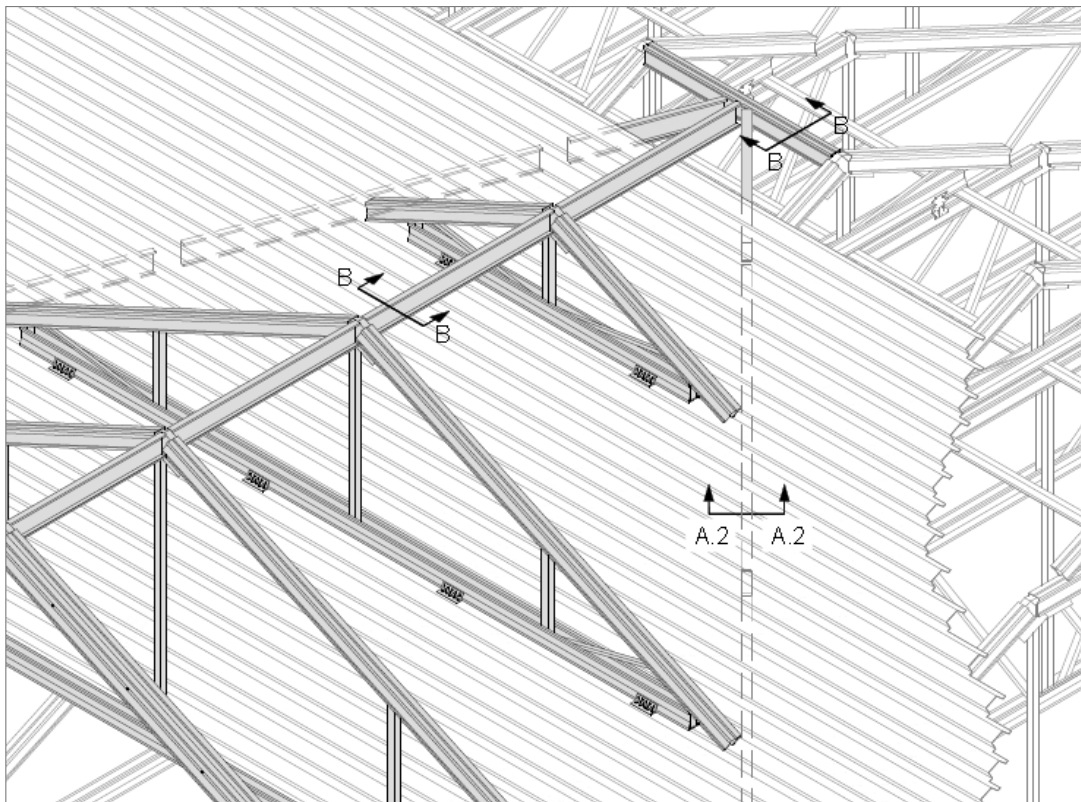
Section A.1 - No Deck Under Dormer Framing
